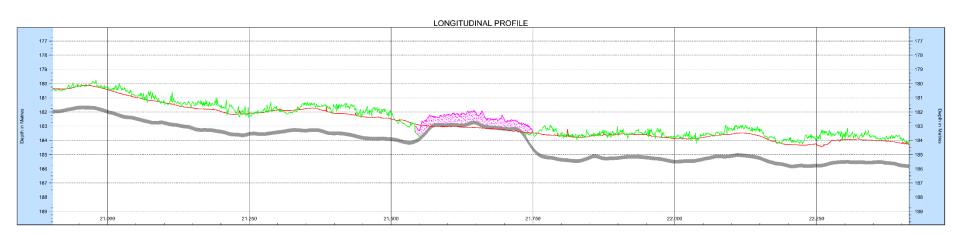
PL4556 As-built alignment sheet KP20.903 to KP22.413
